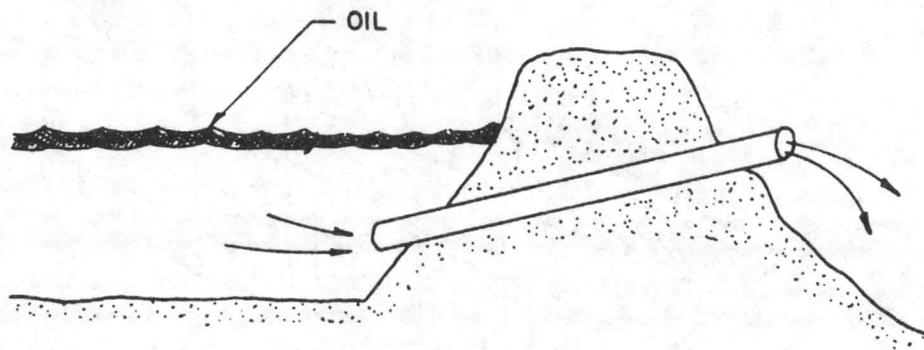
The Construction of a Culvert with an Underflow Dam in a Very Small Creek
